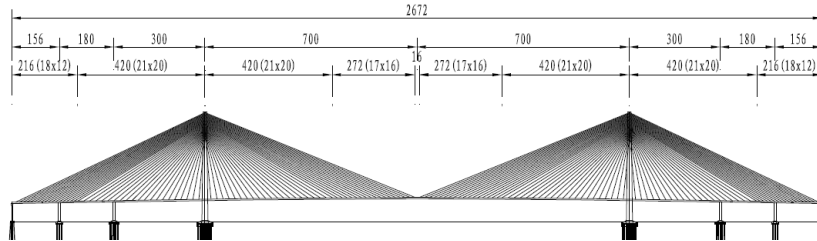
1400m fully self-anchored cable-stayed bridge (Unit: m)
